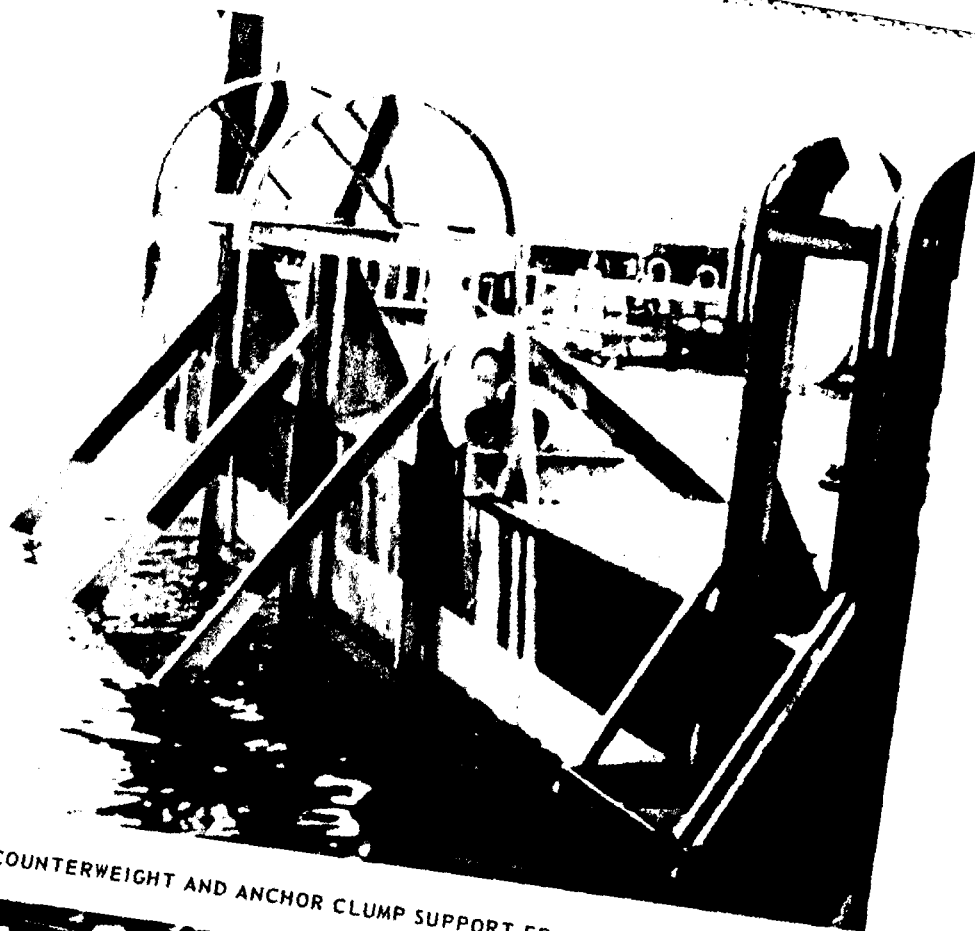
COUNTERWEIGHT AND ANCHOR CLUMP SUPPORT FRAMES
